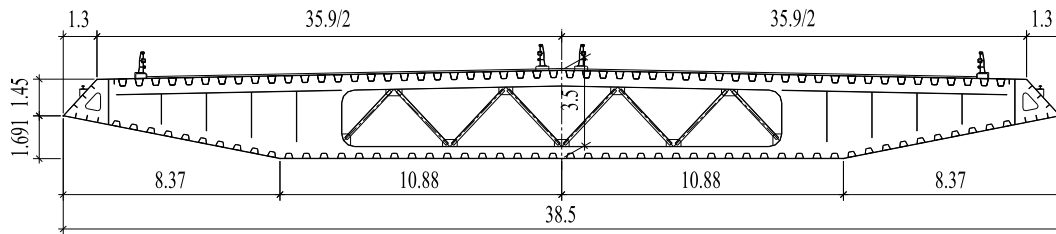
Cross-section of the Maanshan Bridge's deck (unit: m)
